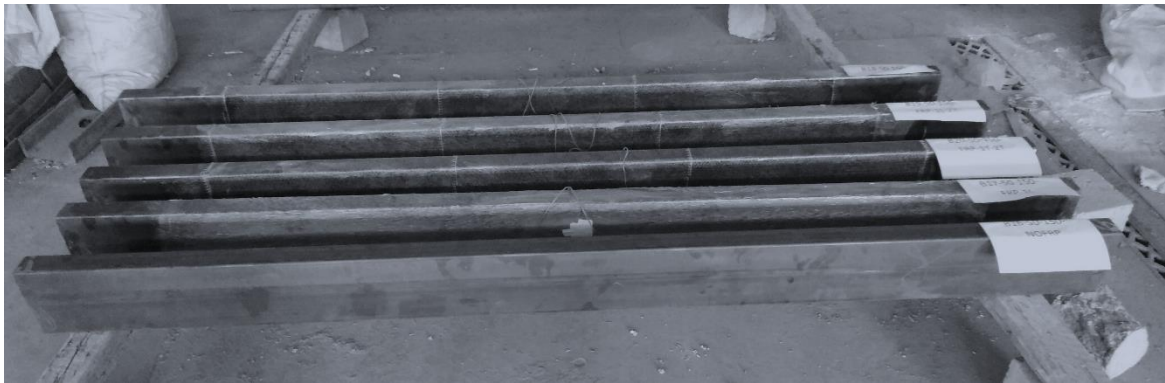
SAMPLES OF PREPARED SPECIMENS AFTER WRAPPING AND FIXING STRAIN GAGES.
